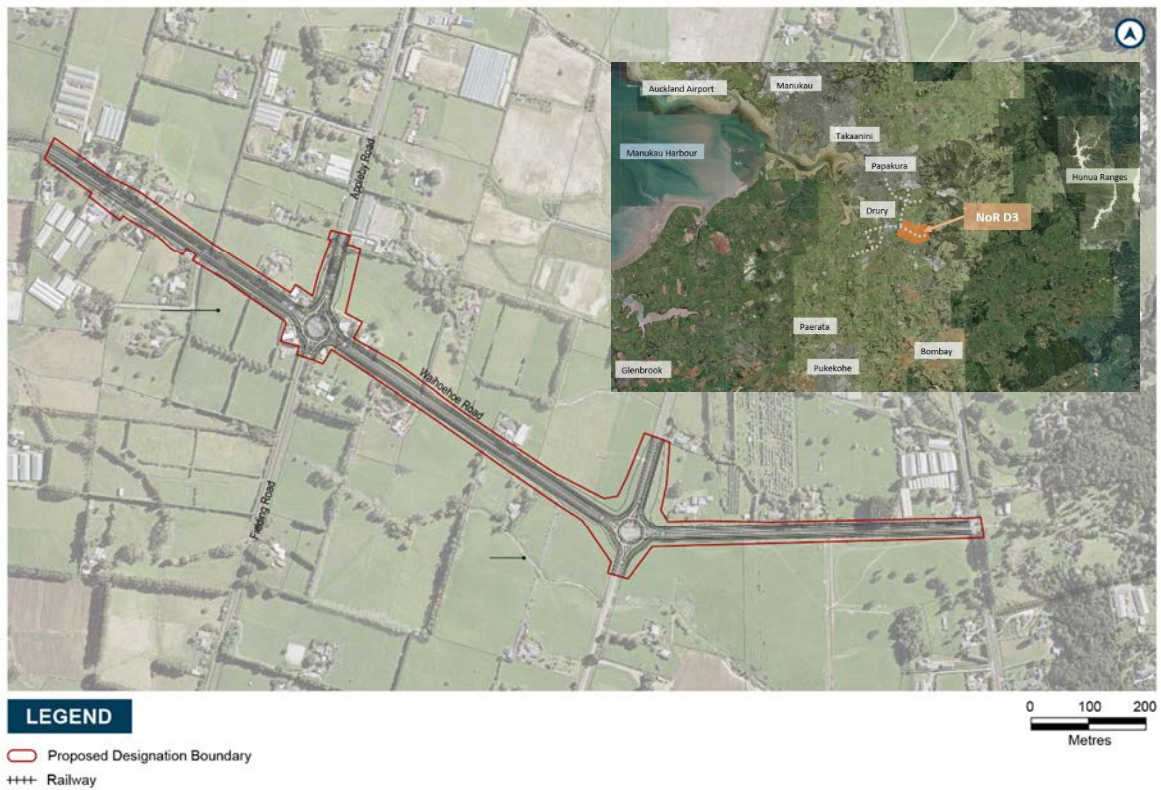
Proposed Waihoehoe Road East Upgrade
